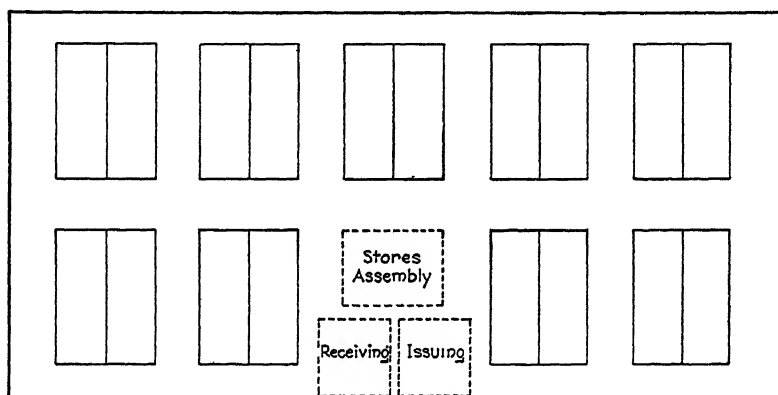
An Effective Storeroom Layout. Windows will be in exterior walls opposite aisles.
